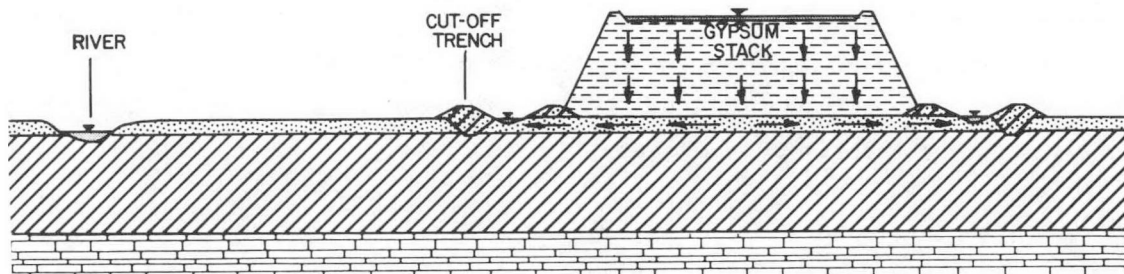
Use of a Cut-Off Trench to Control Seepage From a Gypsum Stack
